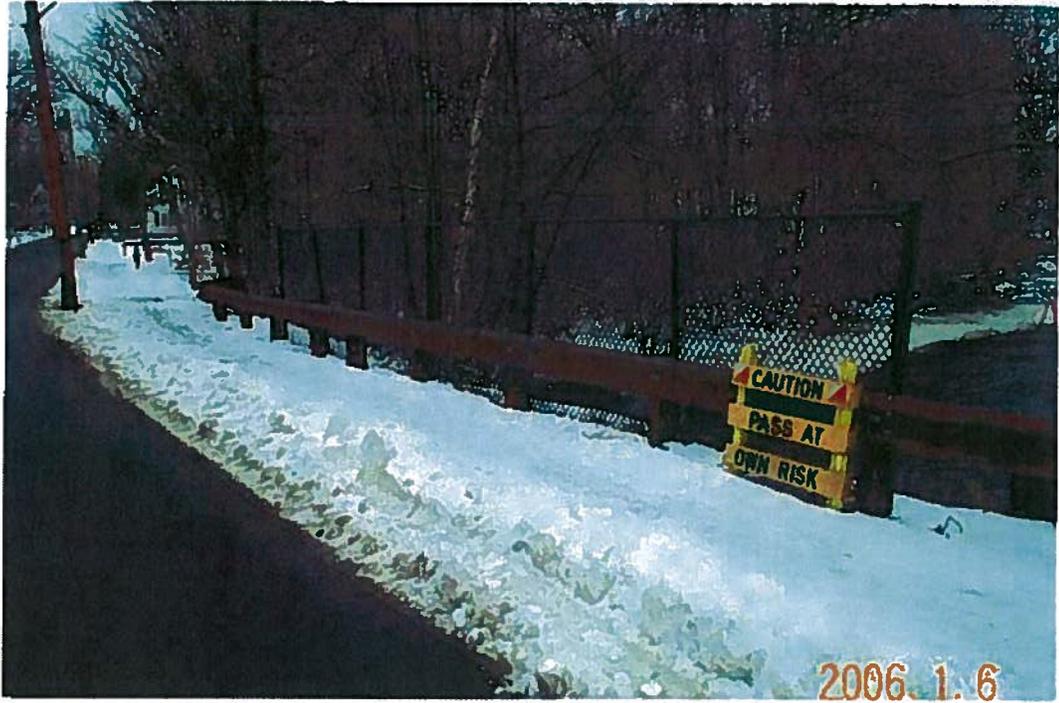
Chain link pedestrian barricade at E side of culvert (sidewalk side)
